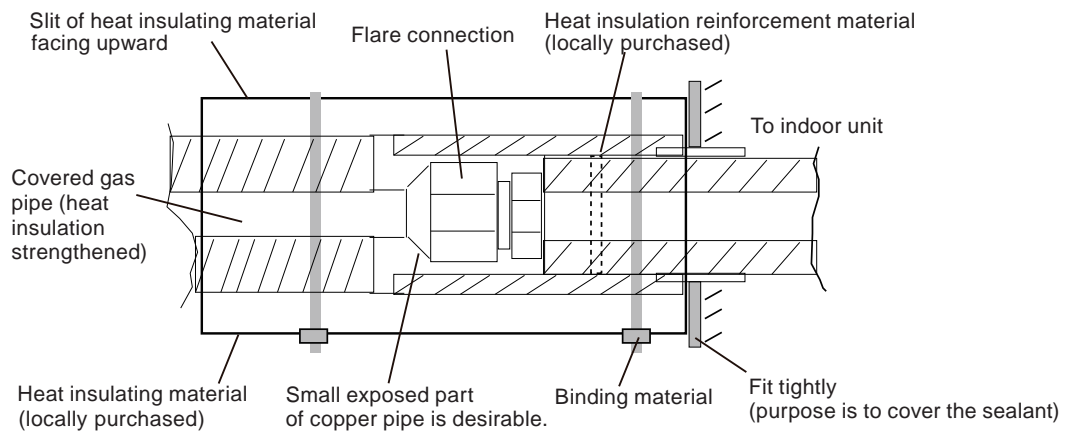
Work method when reinforcing the heat insulation of on-site piping
